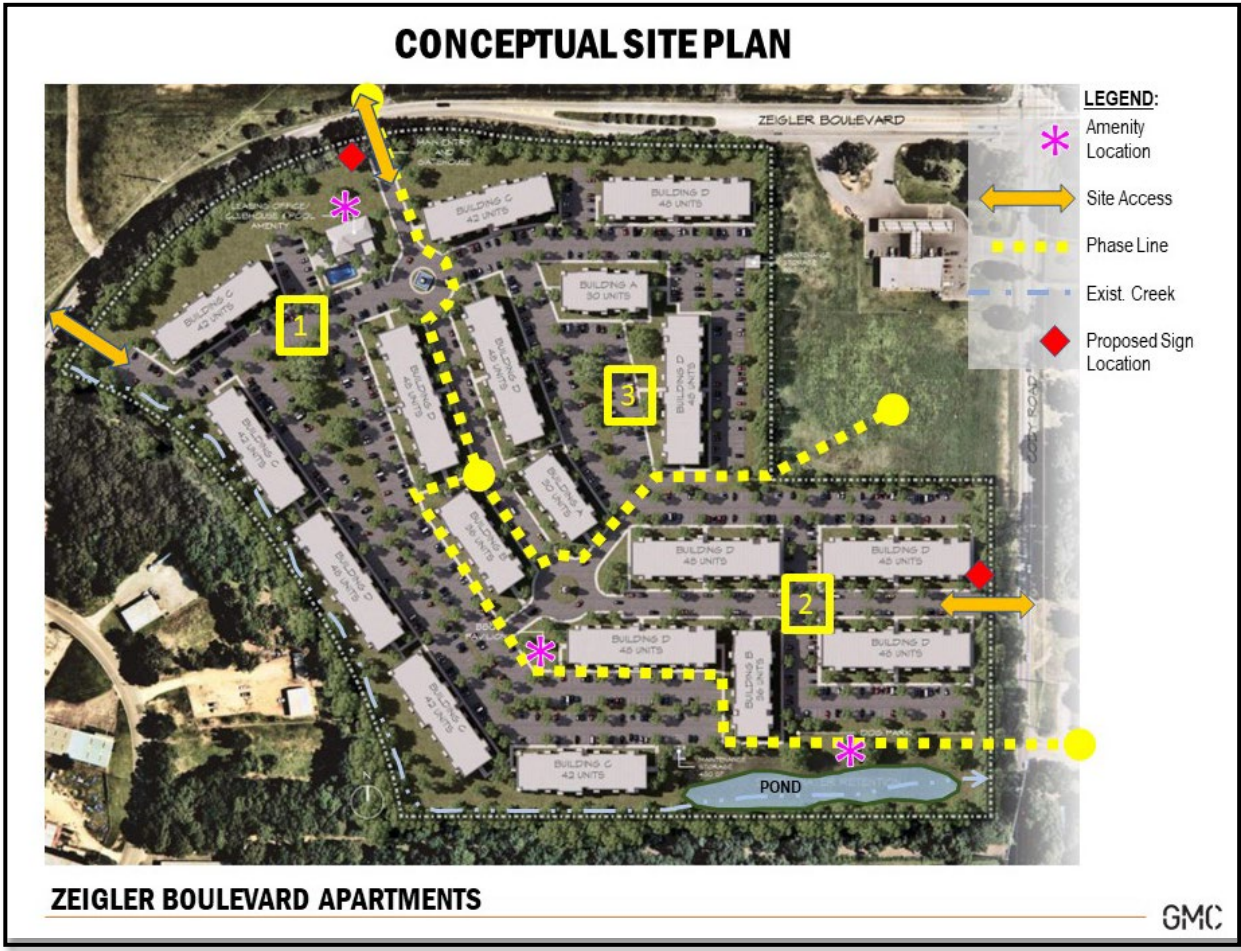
Conceptual Plan for Proposed PUD with phasing. The PUD proposes 774 apartment units built in eighteen (18) 3-story buildings with amenities and on-site stormwater detention. The site will be accessed from Cody Road and Zeigler Boulevard. Plan prepared by GMC.
